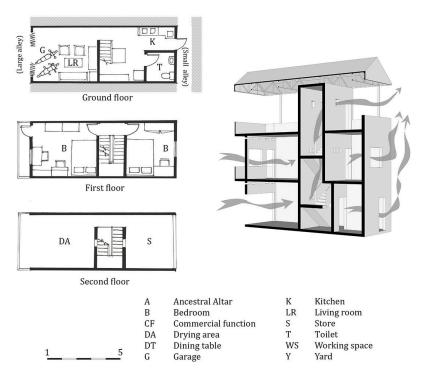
Large door and windows in the front and back for cross ventilation in case H6
